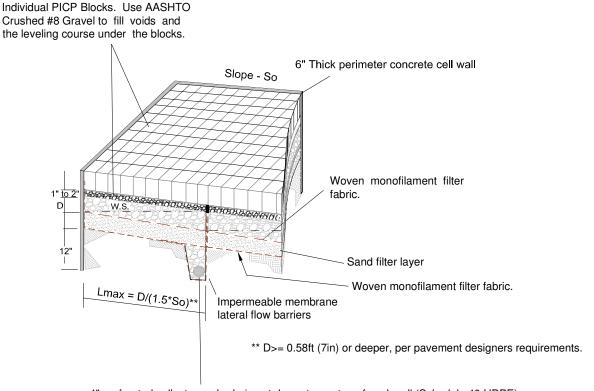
Isometric View of Modular Block Pavement (MBP) Installation
